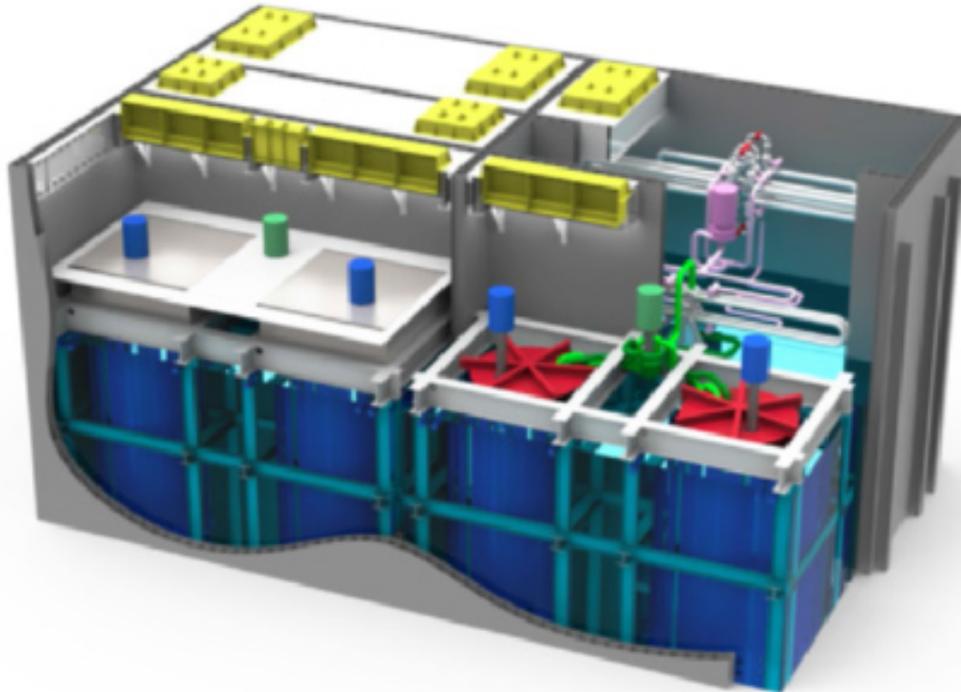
Cutaway view of two module silo hall (Reproduced courtesy of ThorCon)
